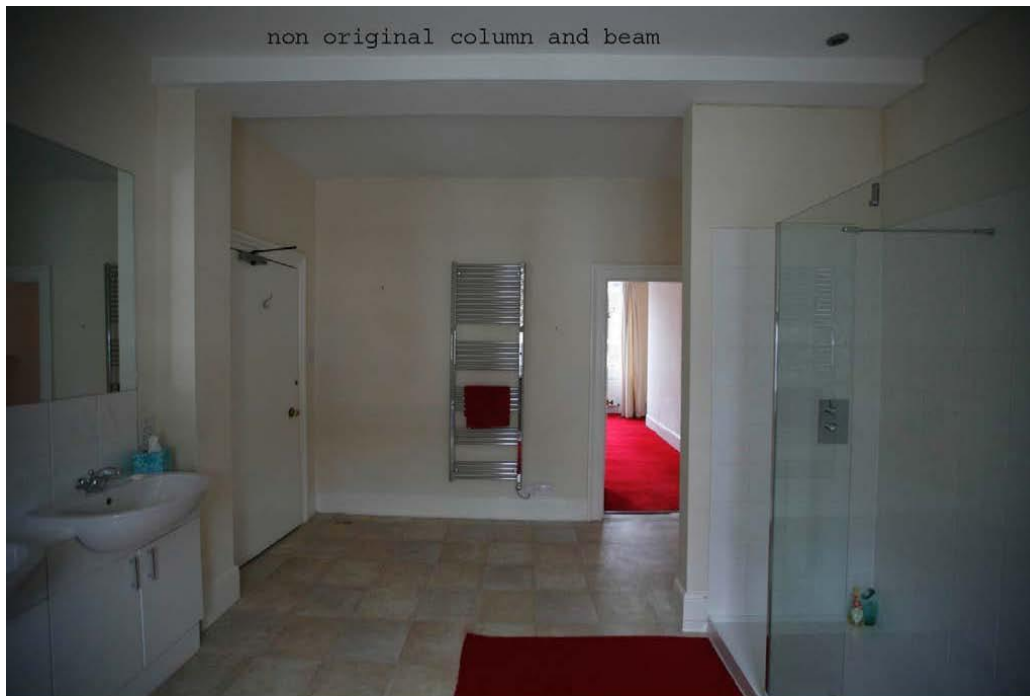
A view of the non original bathroom at second floor level showing the non original columns and beam which are integrated in the current design proposal.
